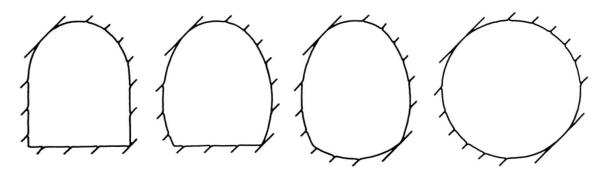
Possible adaptation of tunnel profile to increasing rock pressure
